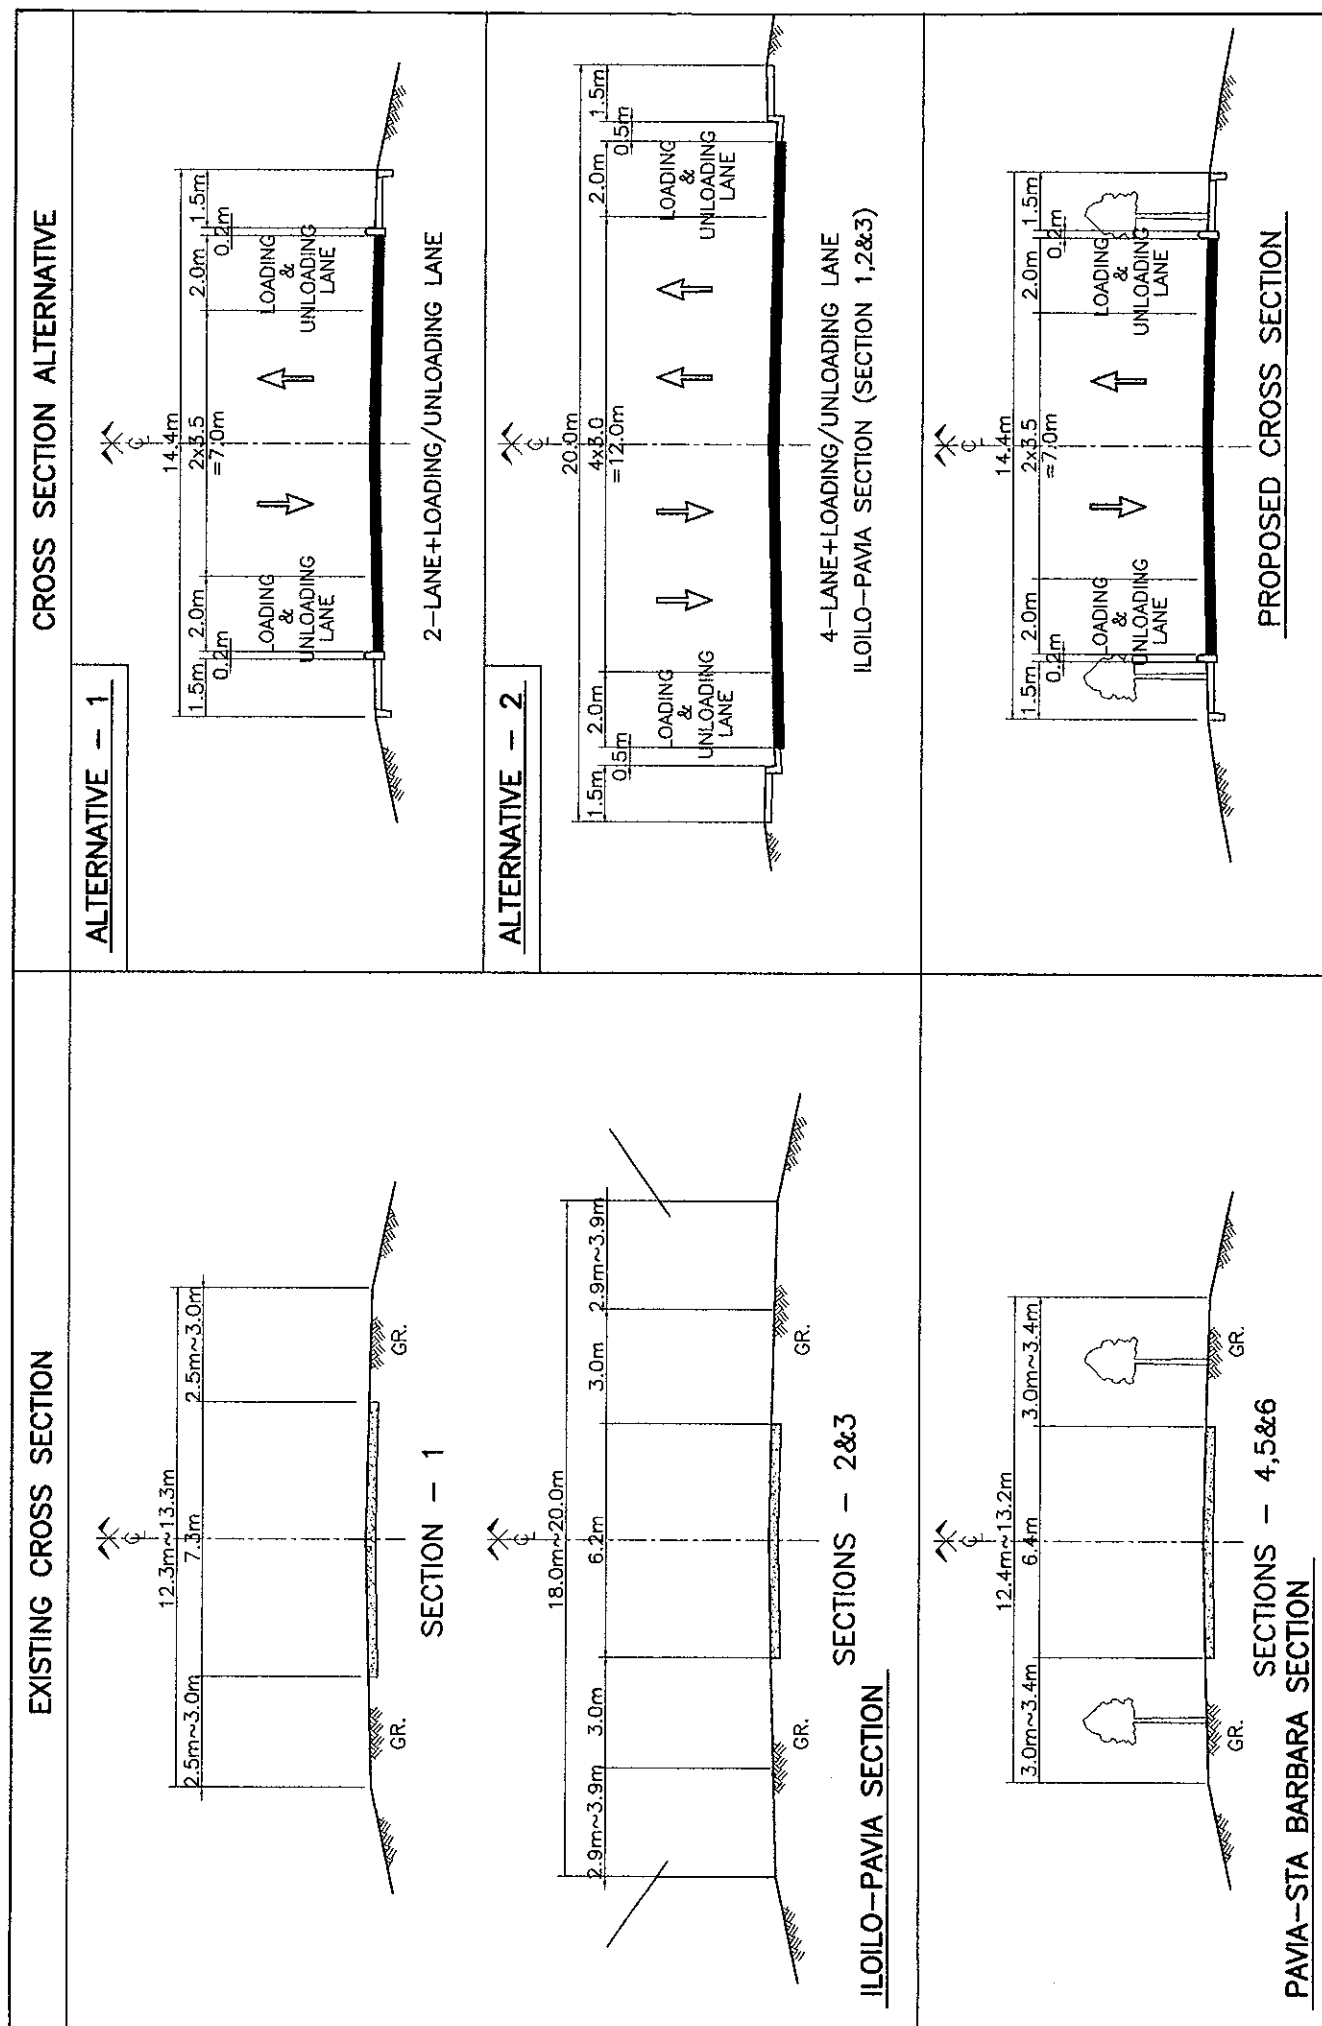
ALTERNATIVE CROSS SECTIONS
